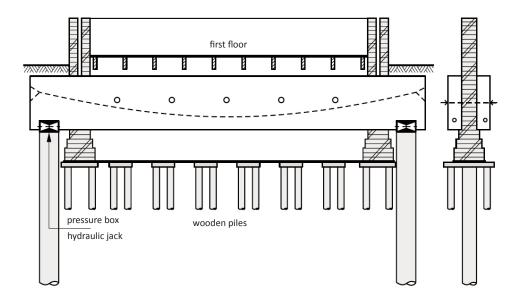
Prestressed concrete beam applied (CURNET, 2007).
